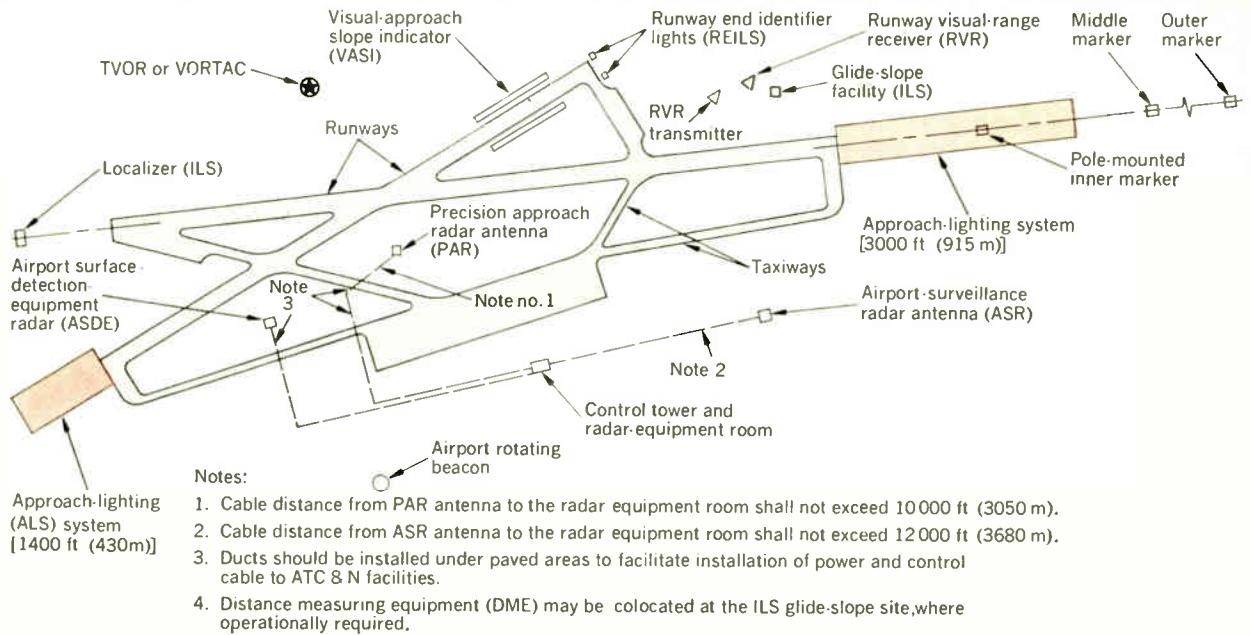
Typical location plan for terminal air-traffic control and navigational facilities.
